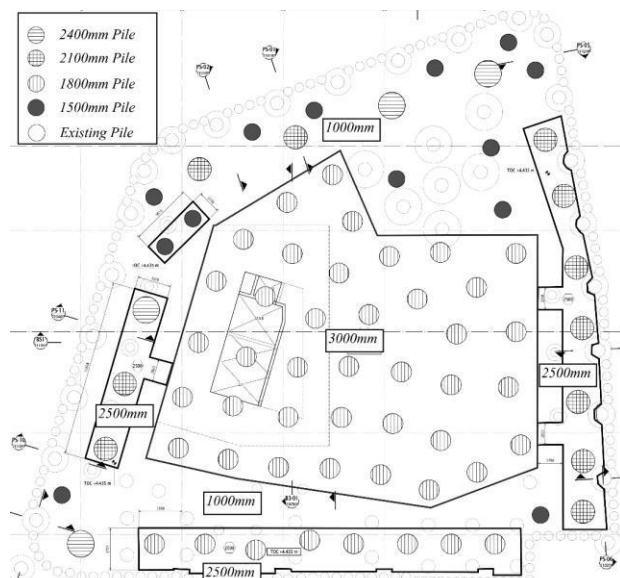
RIBA Stage 3 adopted pile layout and pile cap size.
